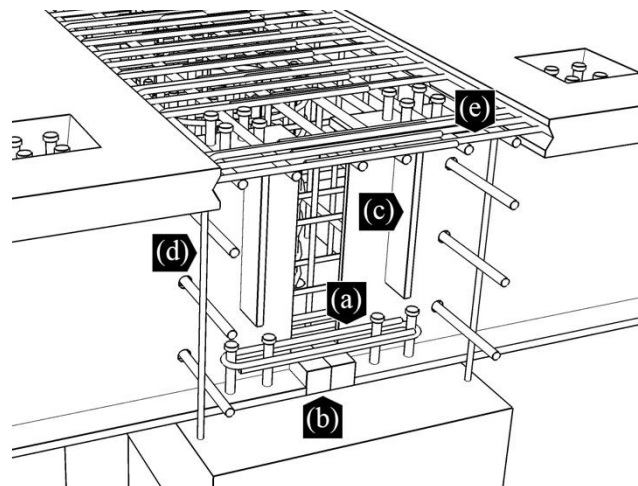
Details of the SDCL connection: (a) tie bar, (b) steel block, (c) stiffener, (d) cap beam stirrups (dowel bars), (e) deck longitudinal bars
